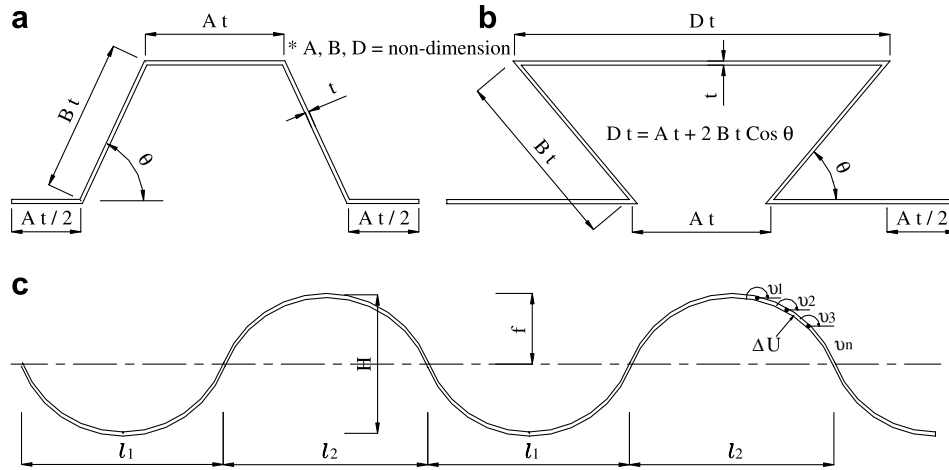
The dimensions of single profiles from typical sections: (a) trapezoidal section, (b) re-entrant section, (c) sinusoidal section.
